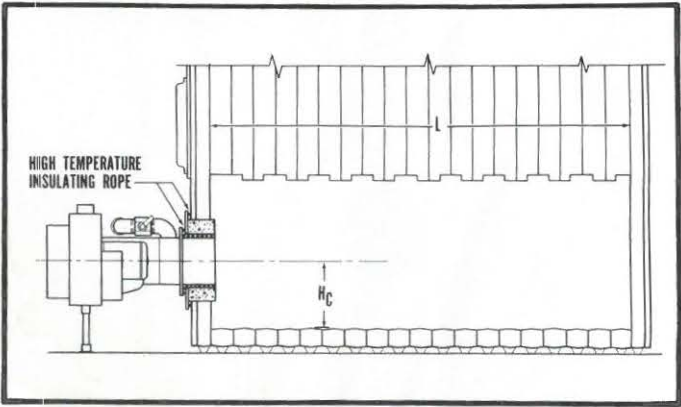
TYPE "FL" BURNER INSTALLATION FIRING CAST IRON BOILER
